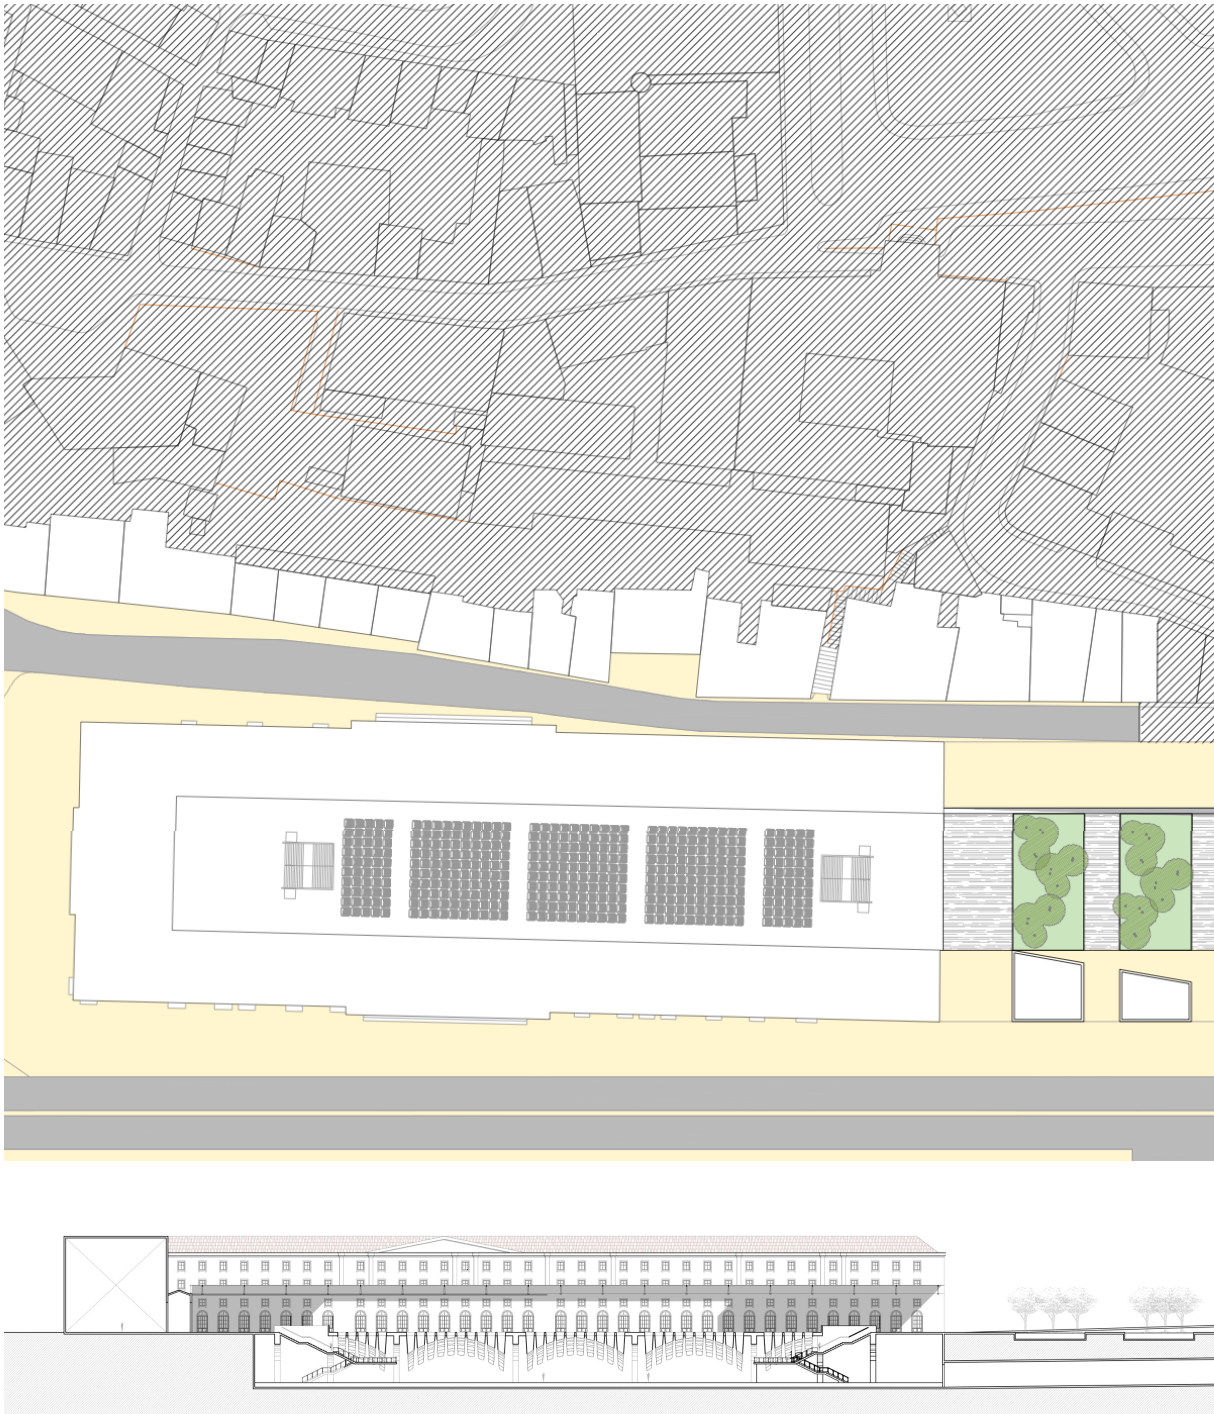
Santa Apolonia metro station renovation plan and section Source: Produces by Author
